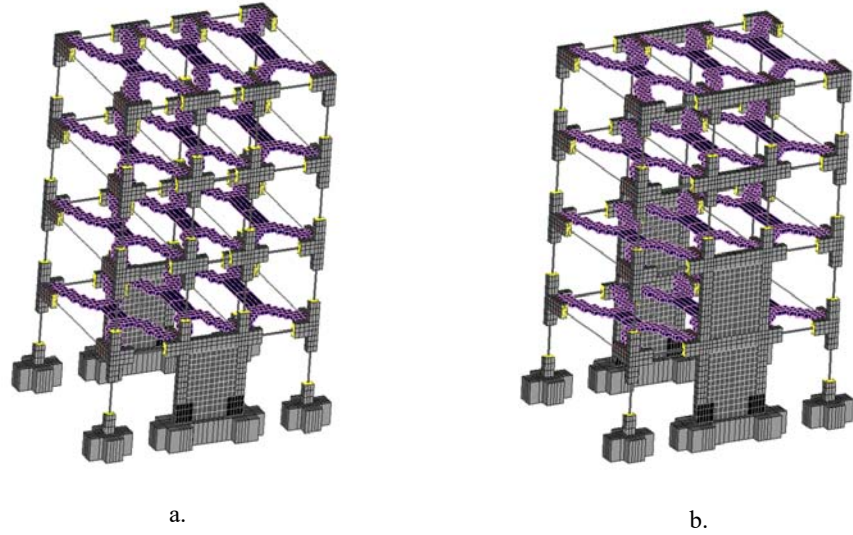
3D mesh view of the 4-storey RC building with infill RC walls at the (a) ground floor and (b) ground and first floors. [3]
